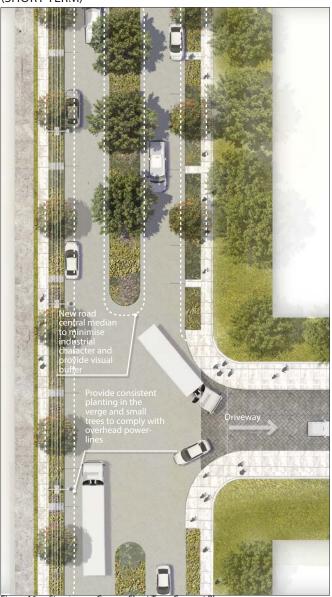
Streetscape Canopy Short Term Concept Plan (Source: AECOM, 2018)
